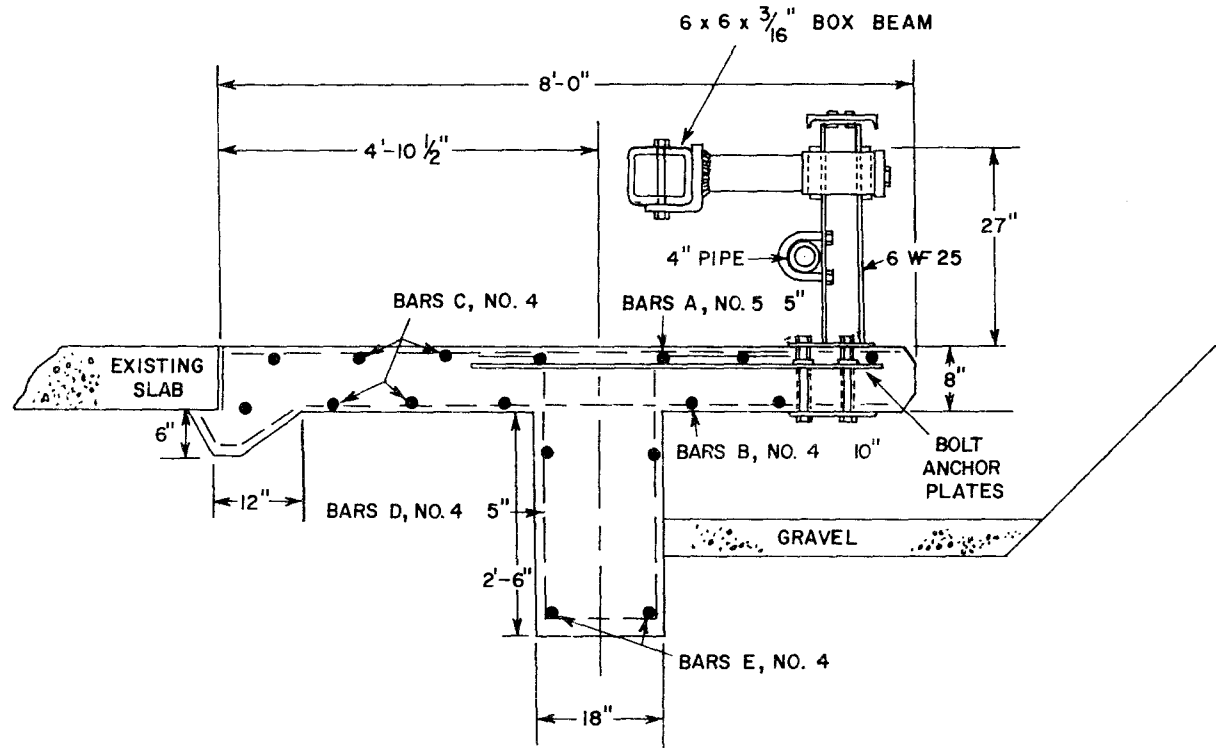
, CROSS SECTION OF BRIDGE DECK AND BRIDGE RAIL
